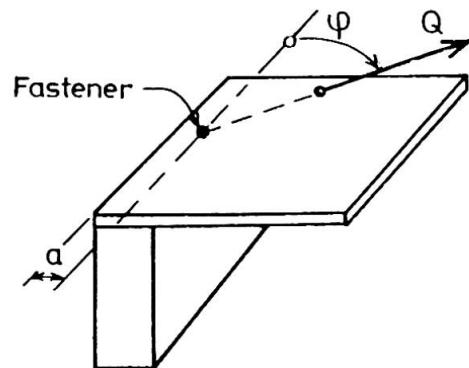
Loading test of mechanical fastener joining panel and lumber.
